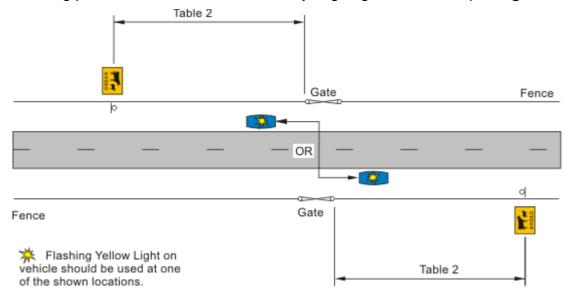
Typical Stock Crossing Site – for bitumen roads.
